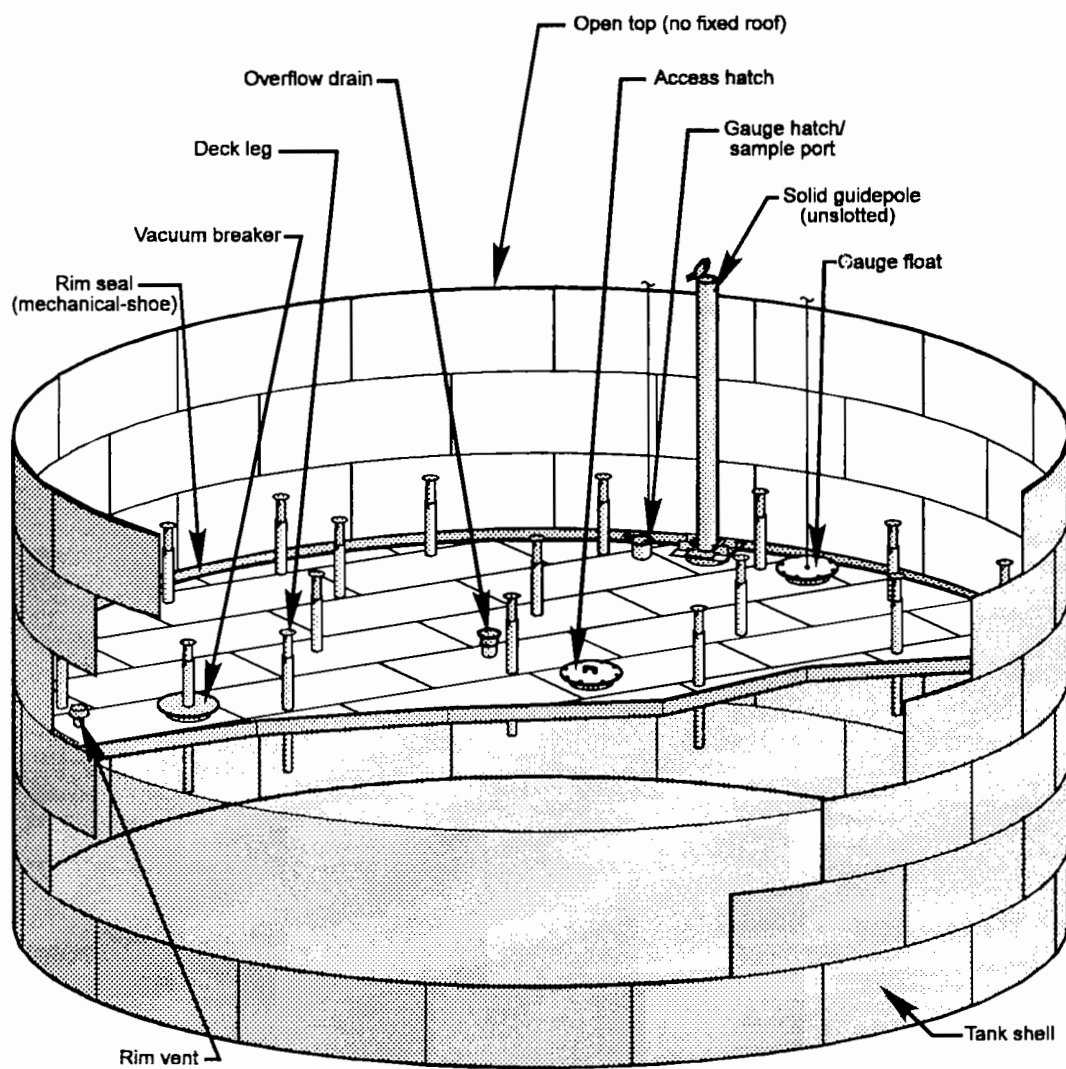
External floating roof tank (double-deck type).²¹
